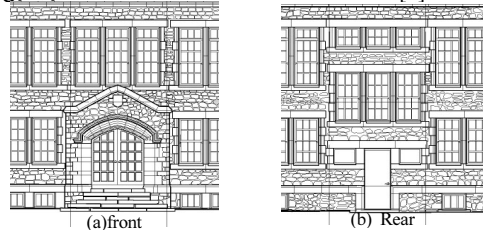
Elevation of Appenzeller Hall Source:[4]
